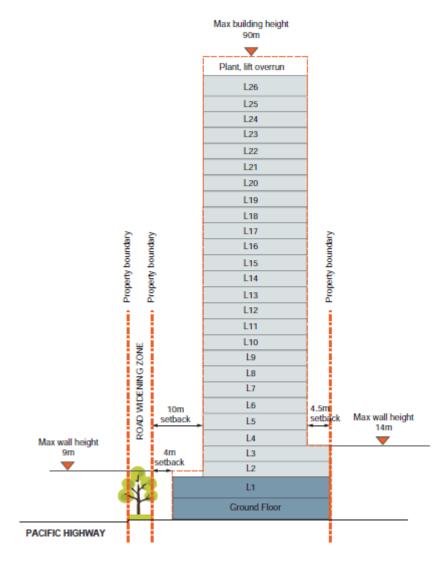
Pacific Highway frontage, building heights and setbacks (building envelope)
